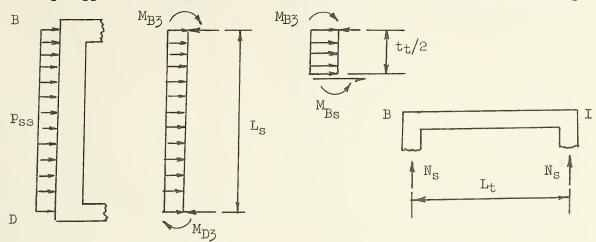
Moment and direct force in sidewall with loading Bl-LC#3.
